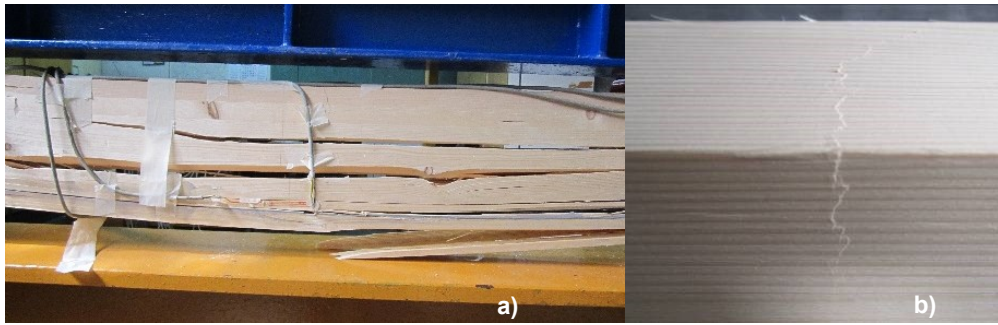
Failure mode of reinforced beams: a) global tensile failure in laminations above CFRP plate; b) compression wrinkles in top laminations
